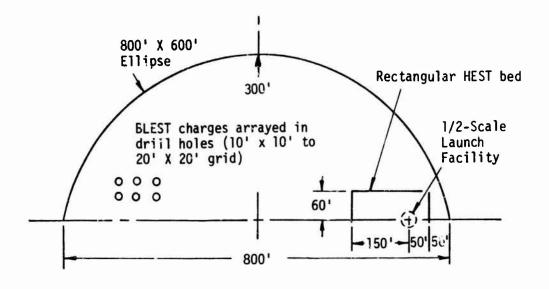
Plan and section view of Event 2 (HEST/BLEST)
